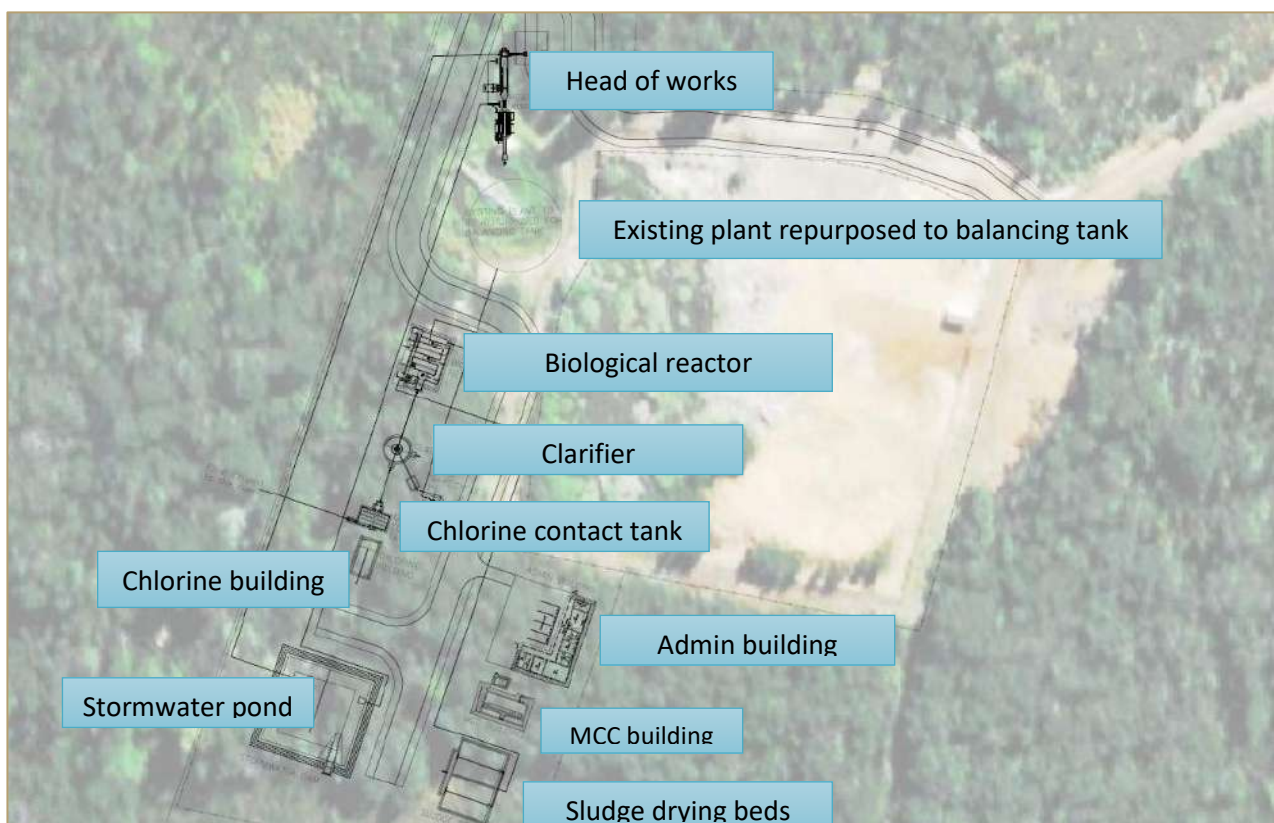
Layout of wastewater treatment components and management facilities (adapted from SMEC, EC0047-WWTW-00-001, REV 0 – Appendix C)
